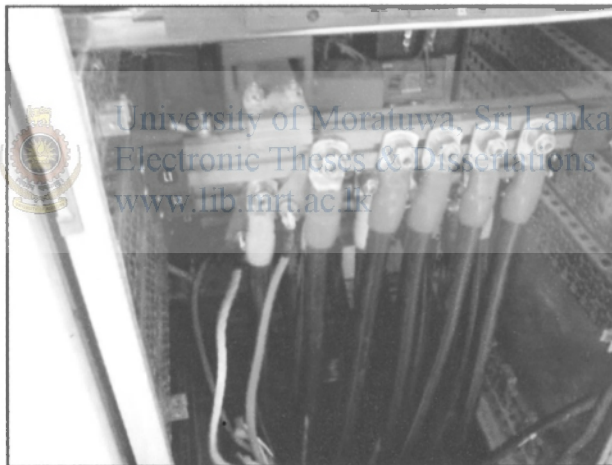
A picture after connecting Load Bank cables at Generator terminals
